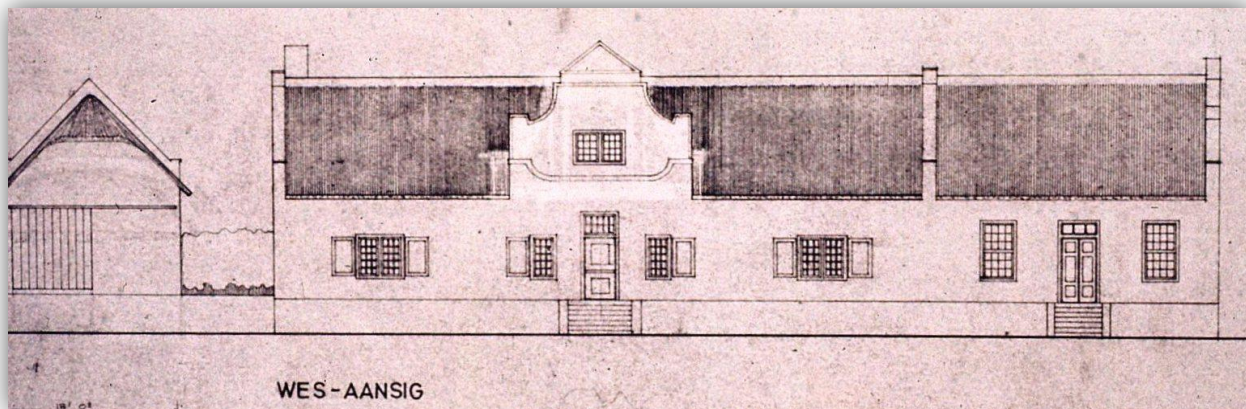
Fagan's elevation, gable and fenestration design for the reconstructed facade of House 24, Church Street (Slide from Fagan archive).
